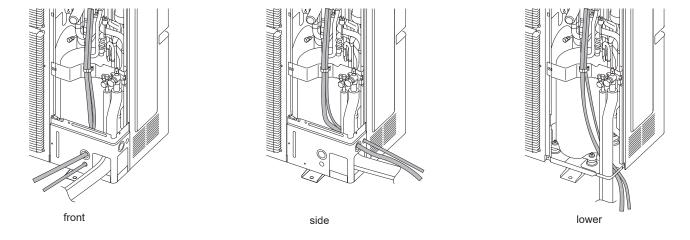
Feeding cables and refrigeration connections from the outdoor unit
